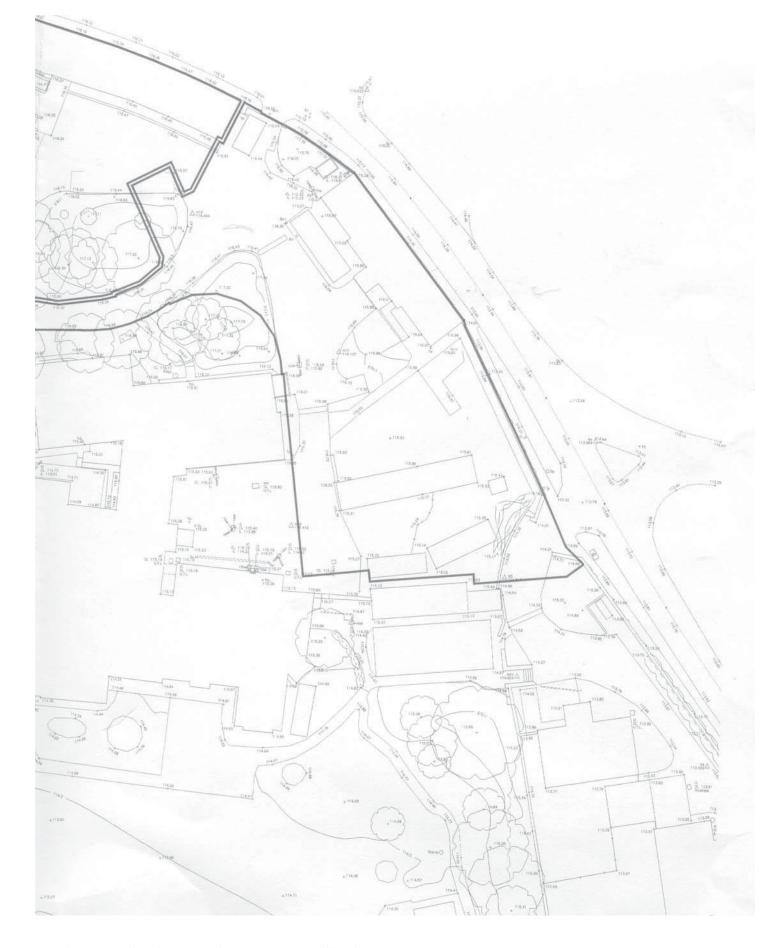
Site plan. Development area outlined (Anthony Rickett Architects Ltd).
